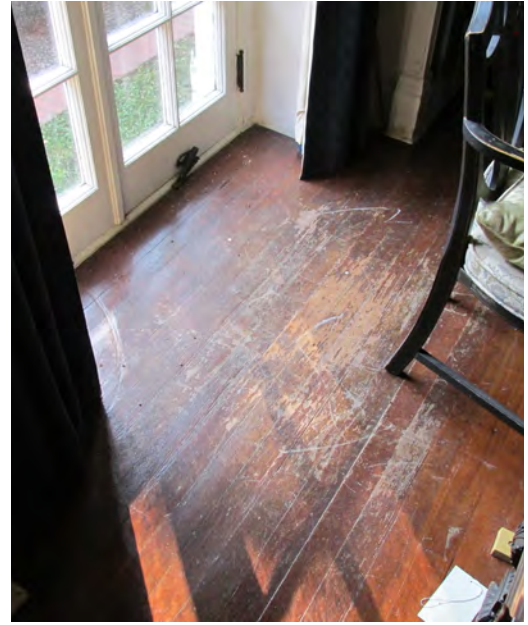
UV damage and scratches at Library (105) floor (HA, 2015)
